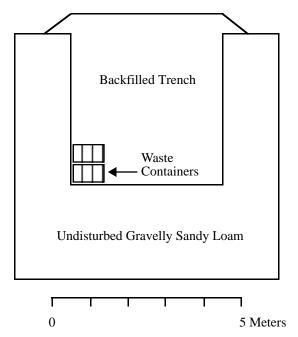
Cross-section of hypothetical arid-site LLW disposal facility
